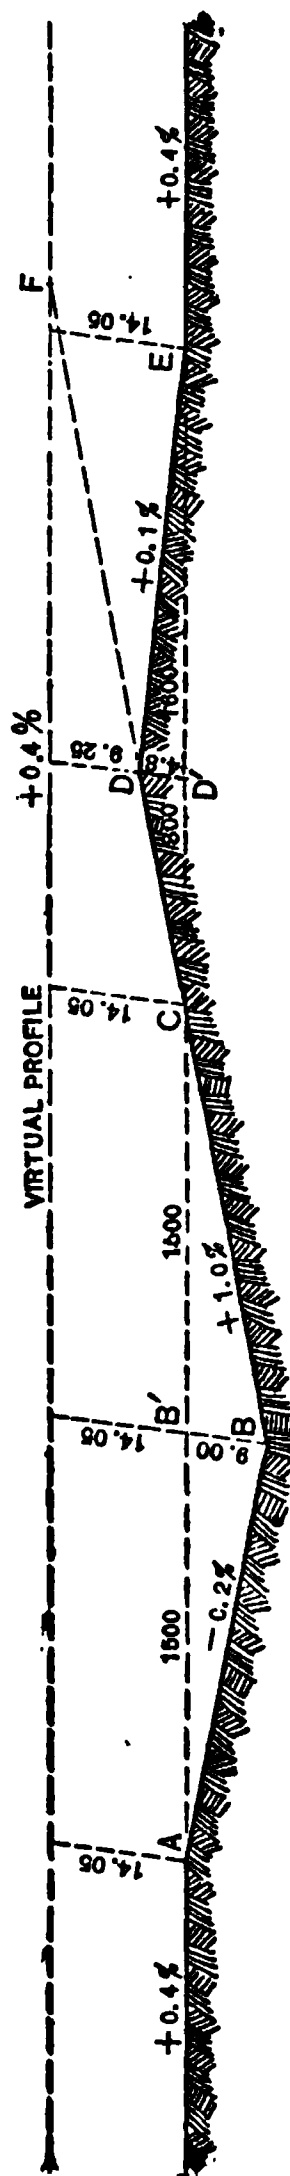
TYPICAL PROFILE OF ROAD SECTION.
